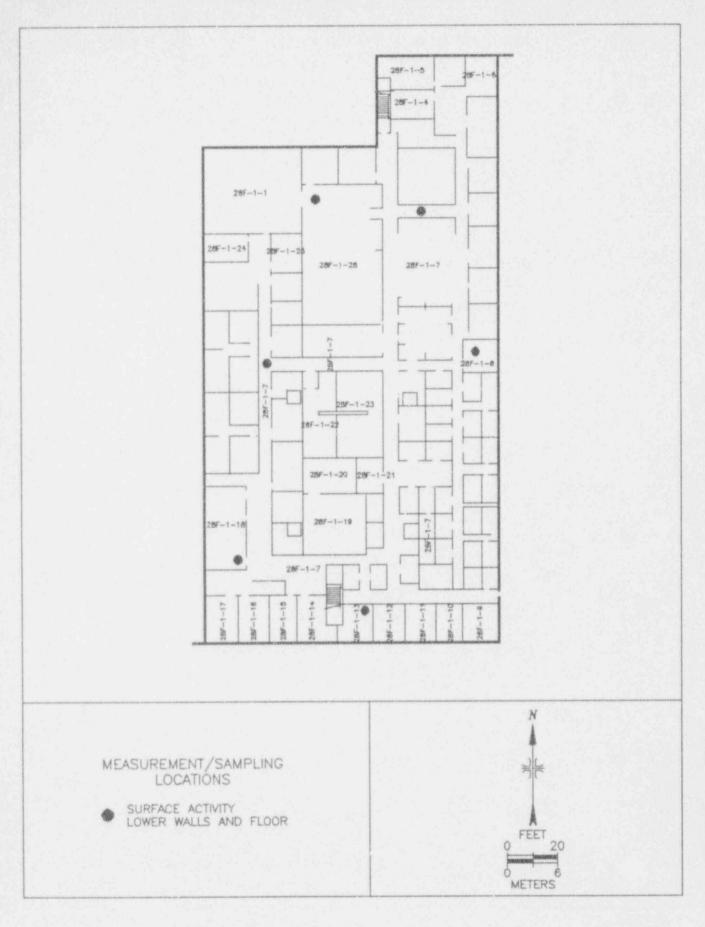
Building 8A, Second Floor - Measurement and Sampling Locations
